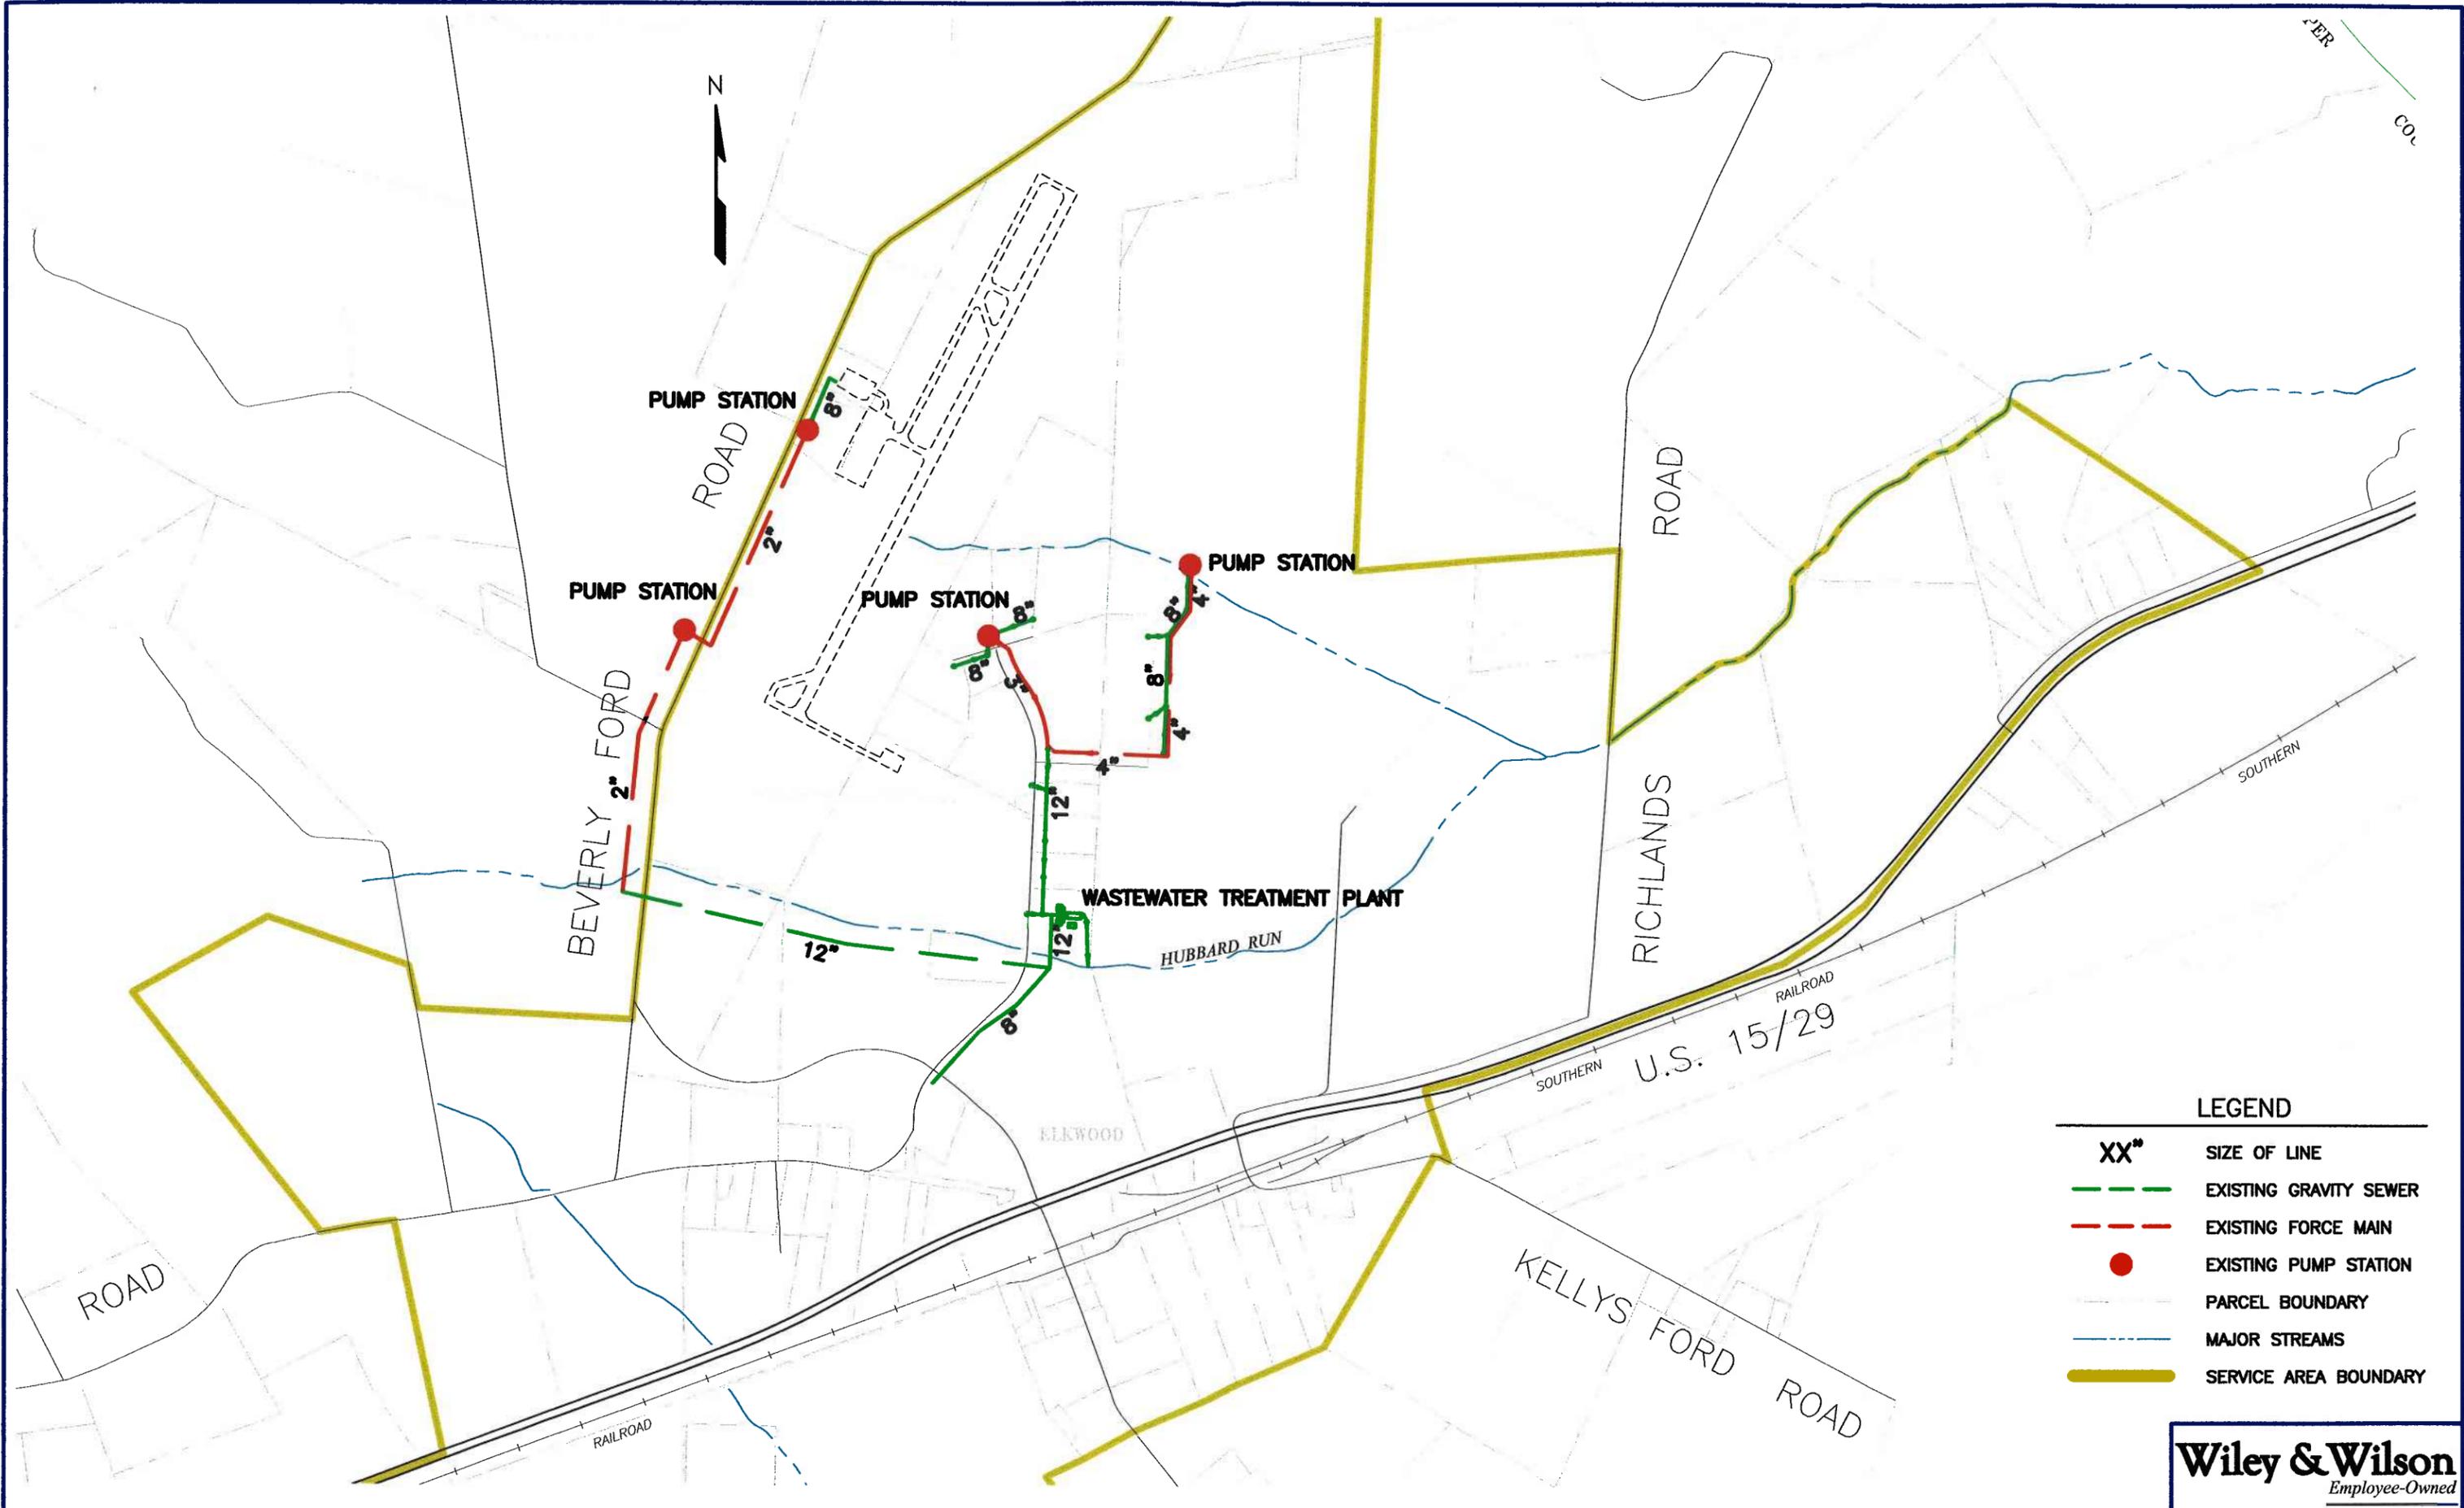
BRANDY STATION/ELKWOOD - EXISTING SEWERAGE SYSTEM
